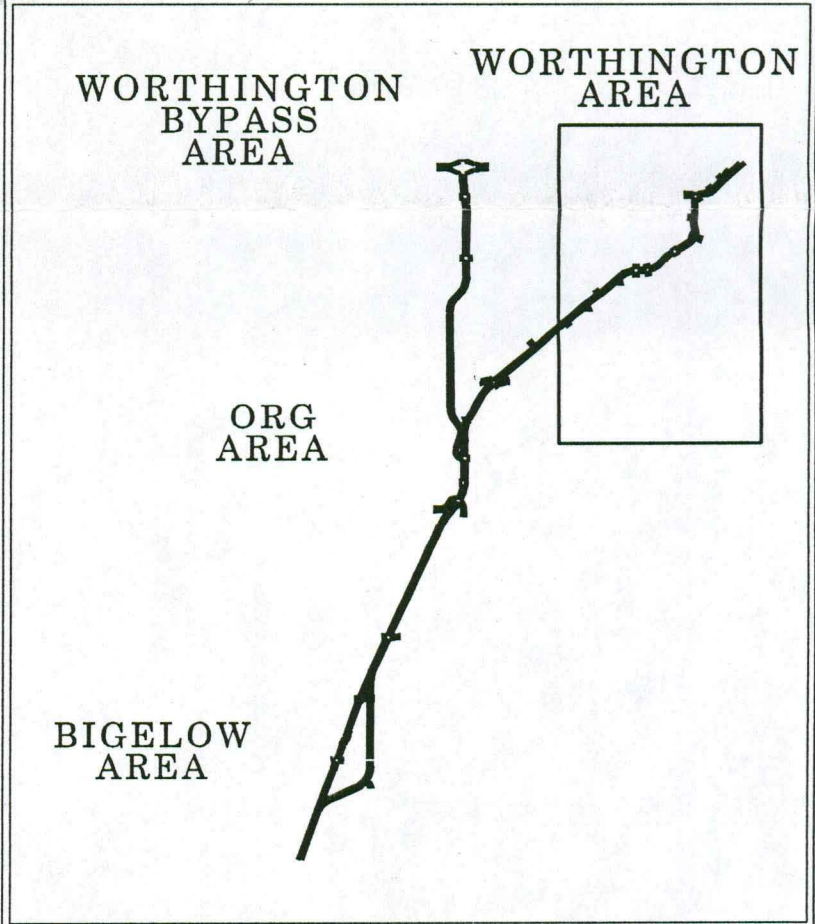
D HIGHWAY 60 RECONSTRUCTION ALTERNATIVES - WORTHINGTON AREA
